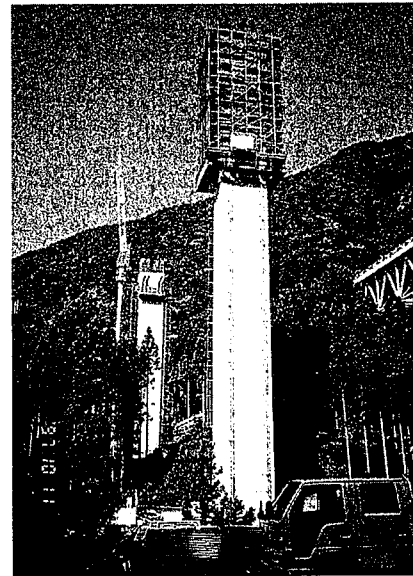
Erection state of Wamisawa Bridge P2, P3 pier
